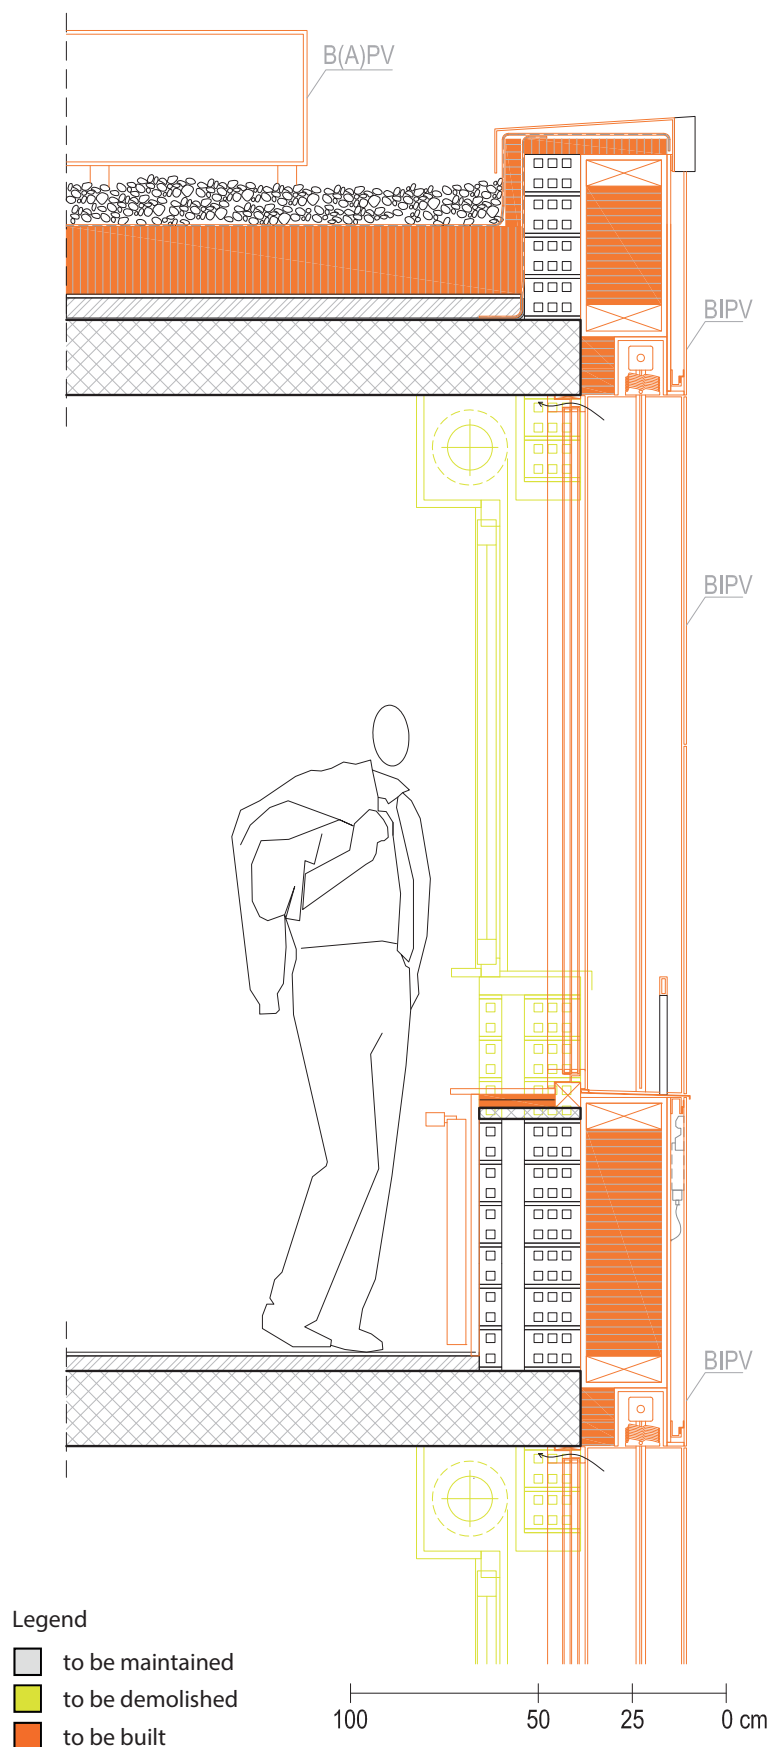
Façade constructive detail, S3 – BIPV Transformation, Archetype 3.
